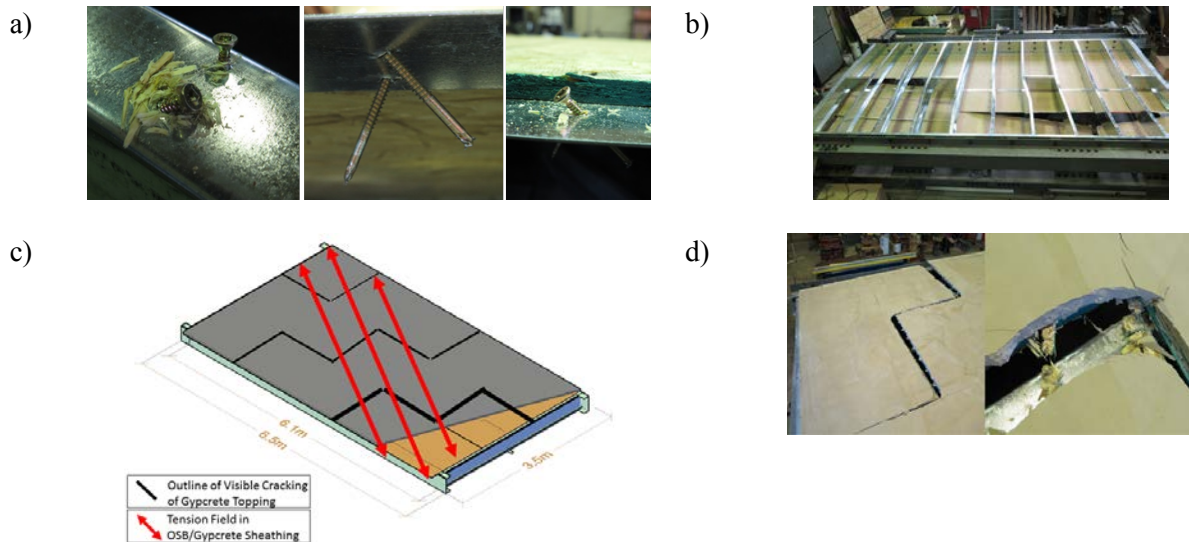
Failure modes; a) RGYP, typical screw failure modes, b) RGYP, separation of gypsum panels, c) FCRETE, gypcrete topping cracking and d) FCRETE, OSB panel separation and tear out failure of connections
